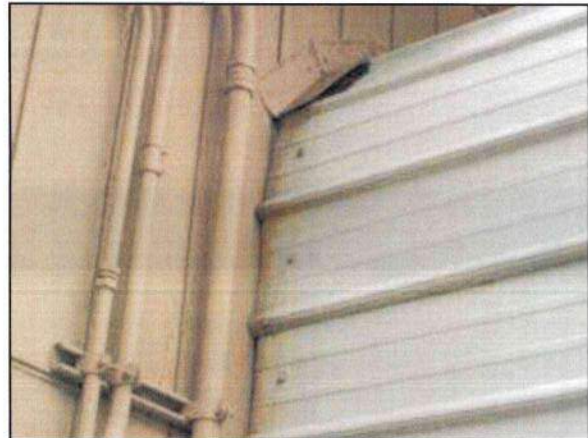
Fire Station #4 The steel addition is not properly sealed and flashed to the main building.
